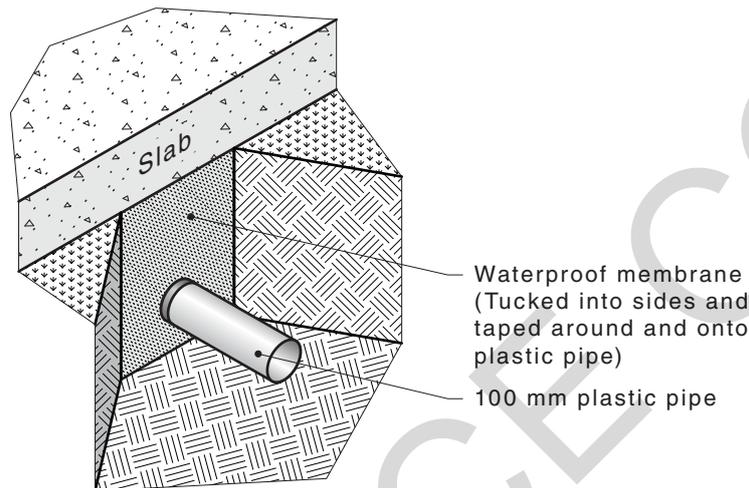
(B) TYPICAL INSTALLATION OF DAMP-PROOFING MEMBRANE
